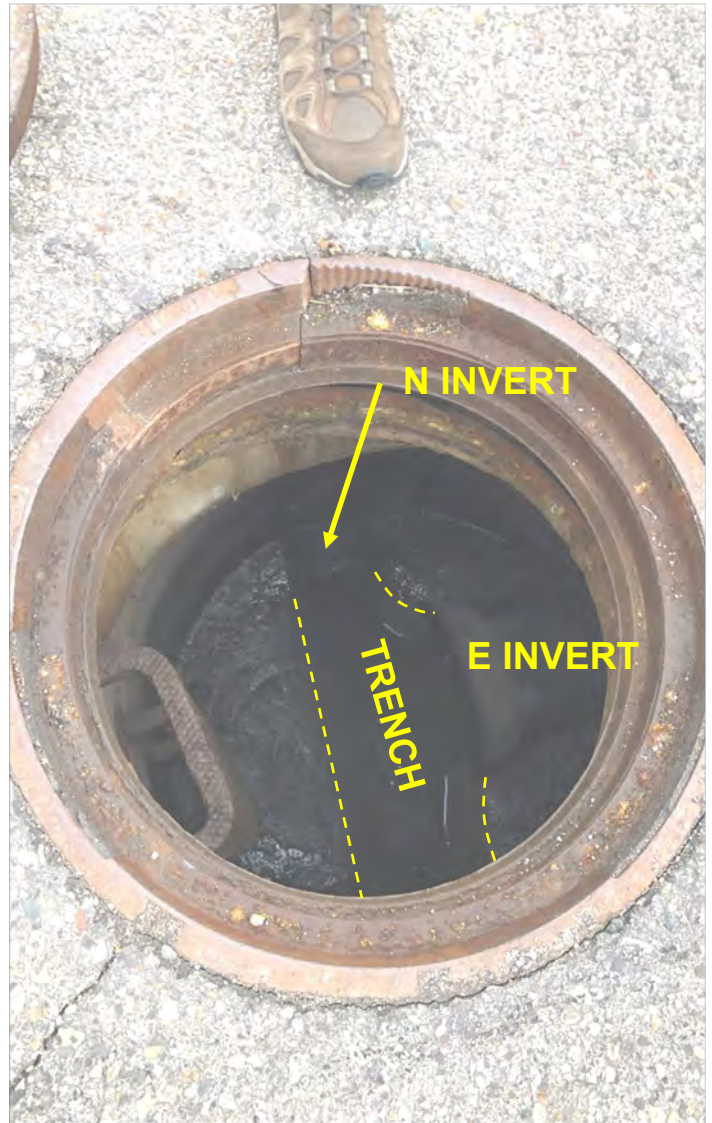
Manhole MH-12 interior with low water level and visible concrete trench & inverts, and trace sediment. View to northwest; photograph taken on April 4, 2022.
